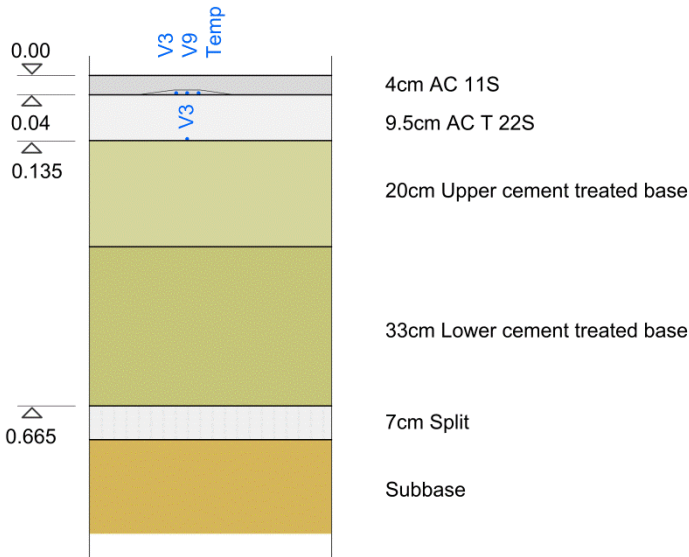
Cross section of the new pavement structure in the vicinity of the instrumented area
